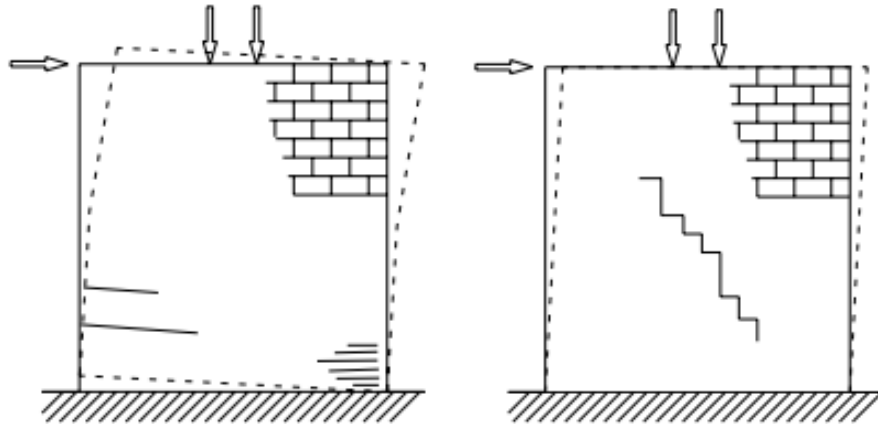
Cracking of Flexural Failure (left) and Shear Failure (right)
